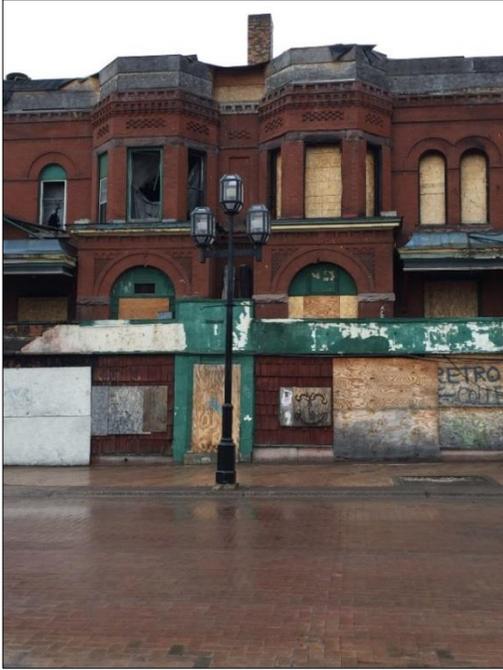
Kozy Bar addition, temporary roof parapet over fire damaged portion of original Pastoret building
